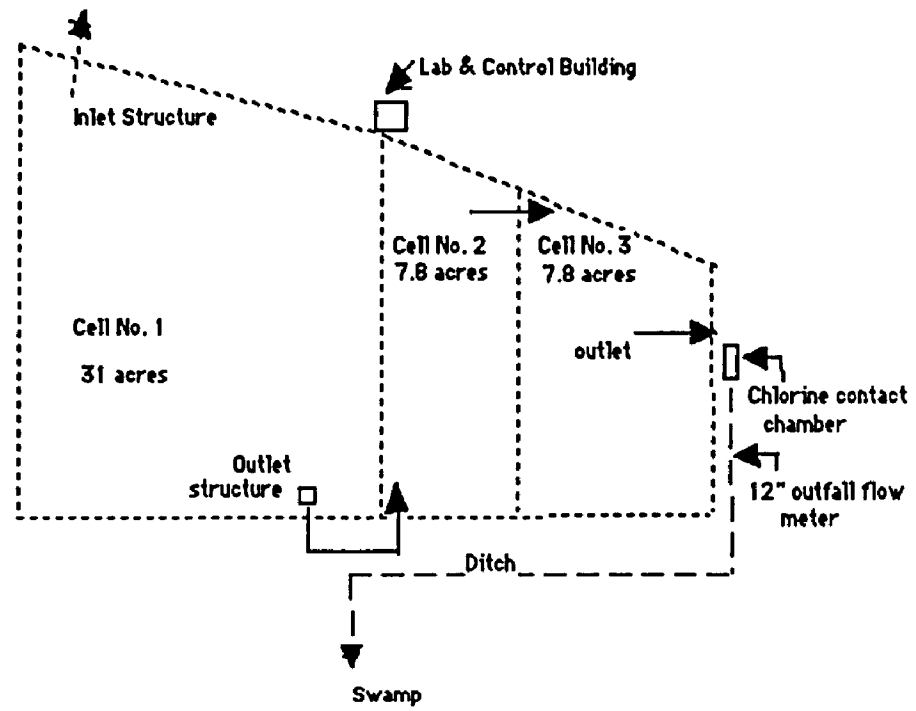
Existing Breaux Bridge Water Treatment Facility.
